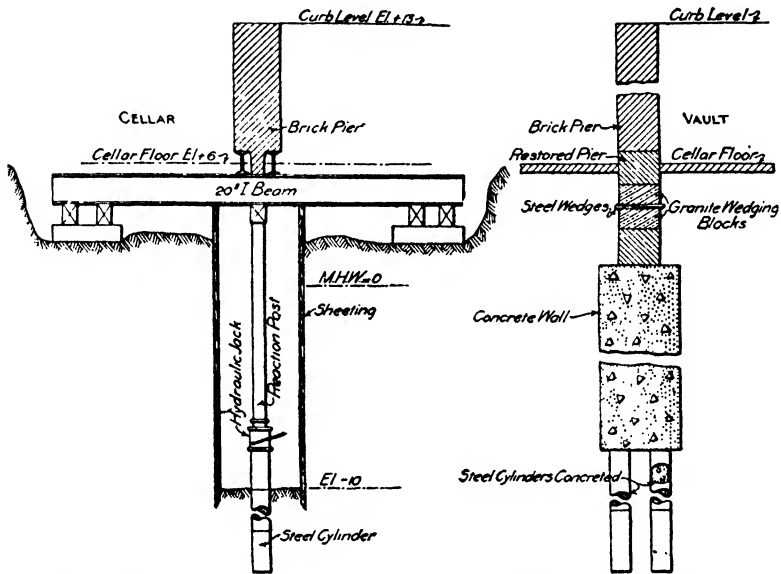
Method of Underpinning Centre Street Buildings, New York, Due to Subway Excavations.
